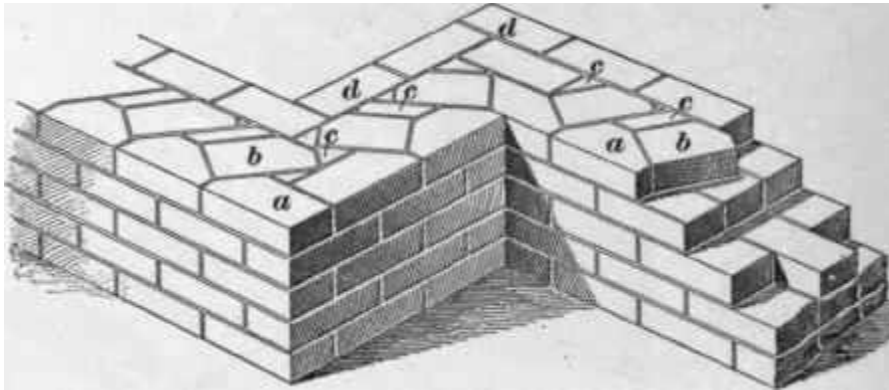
Some larger stones protrude into the core of the wall tying the faces together
